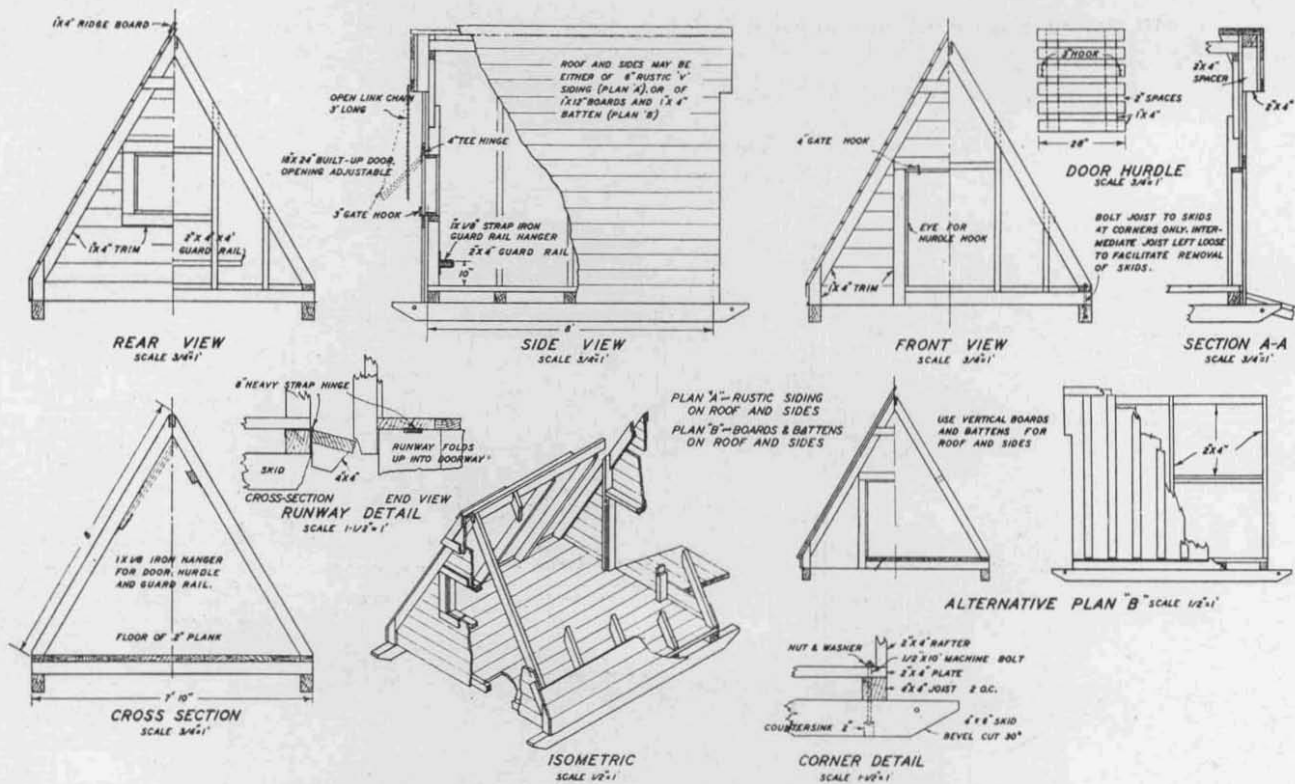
"A" type field house. Plan (A) with rustic siding, roof and ends. Plan (B) with boards and battens. (Specifications for all types of equipment discussed in this bulletin available through Department of Agricultural Engineering of this Station.)
